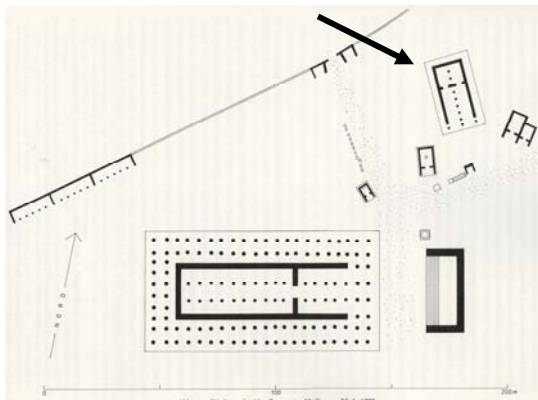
Plan of Nordbau on Samos and surrounding area (after Furtwängler and Kienast 1989)
